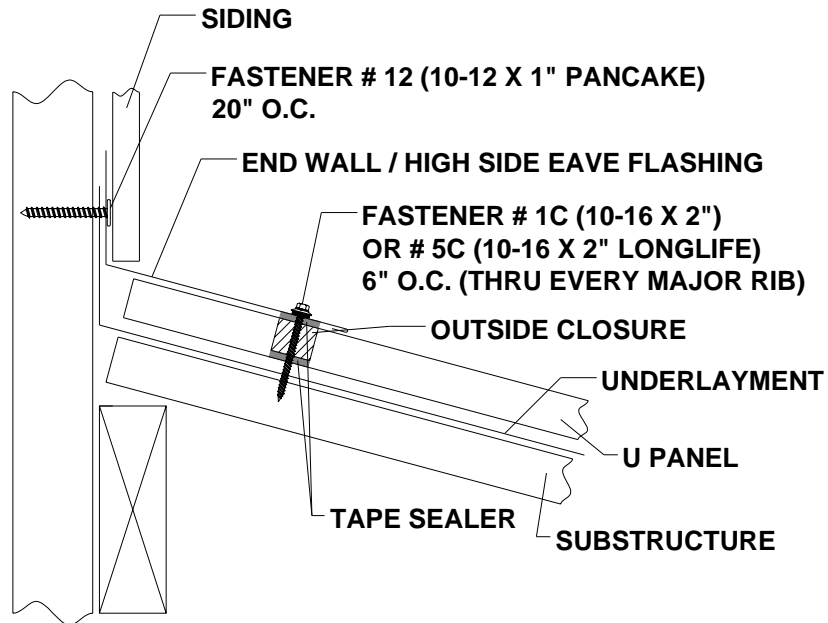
Typical Endwall Parapet Highside Eave Flashing Detail
